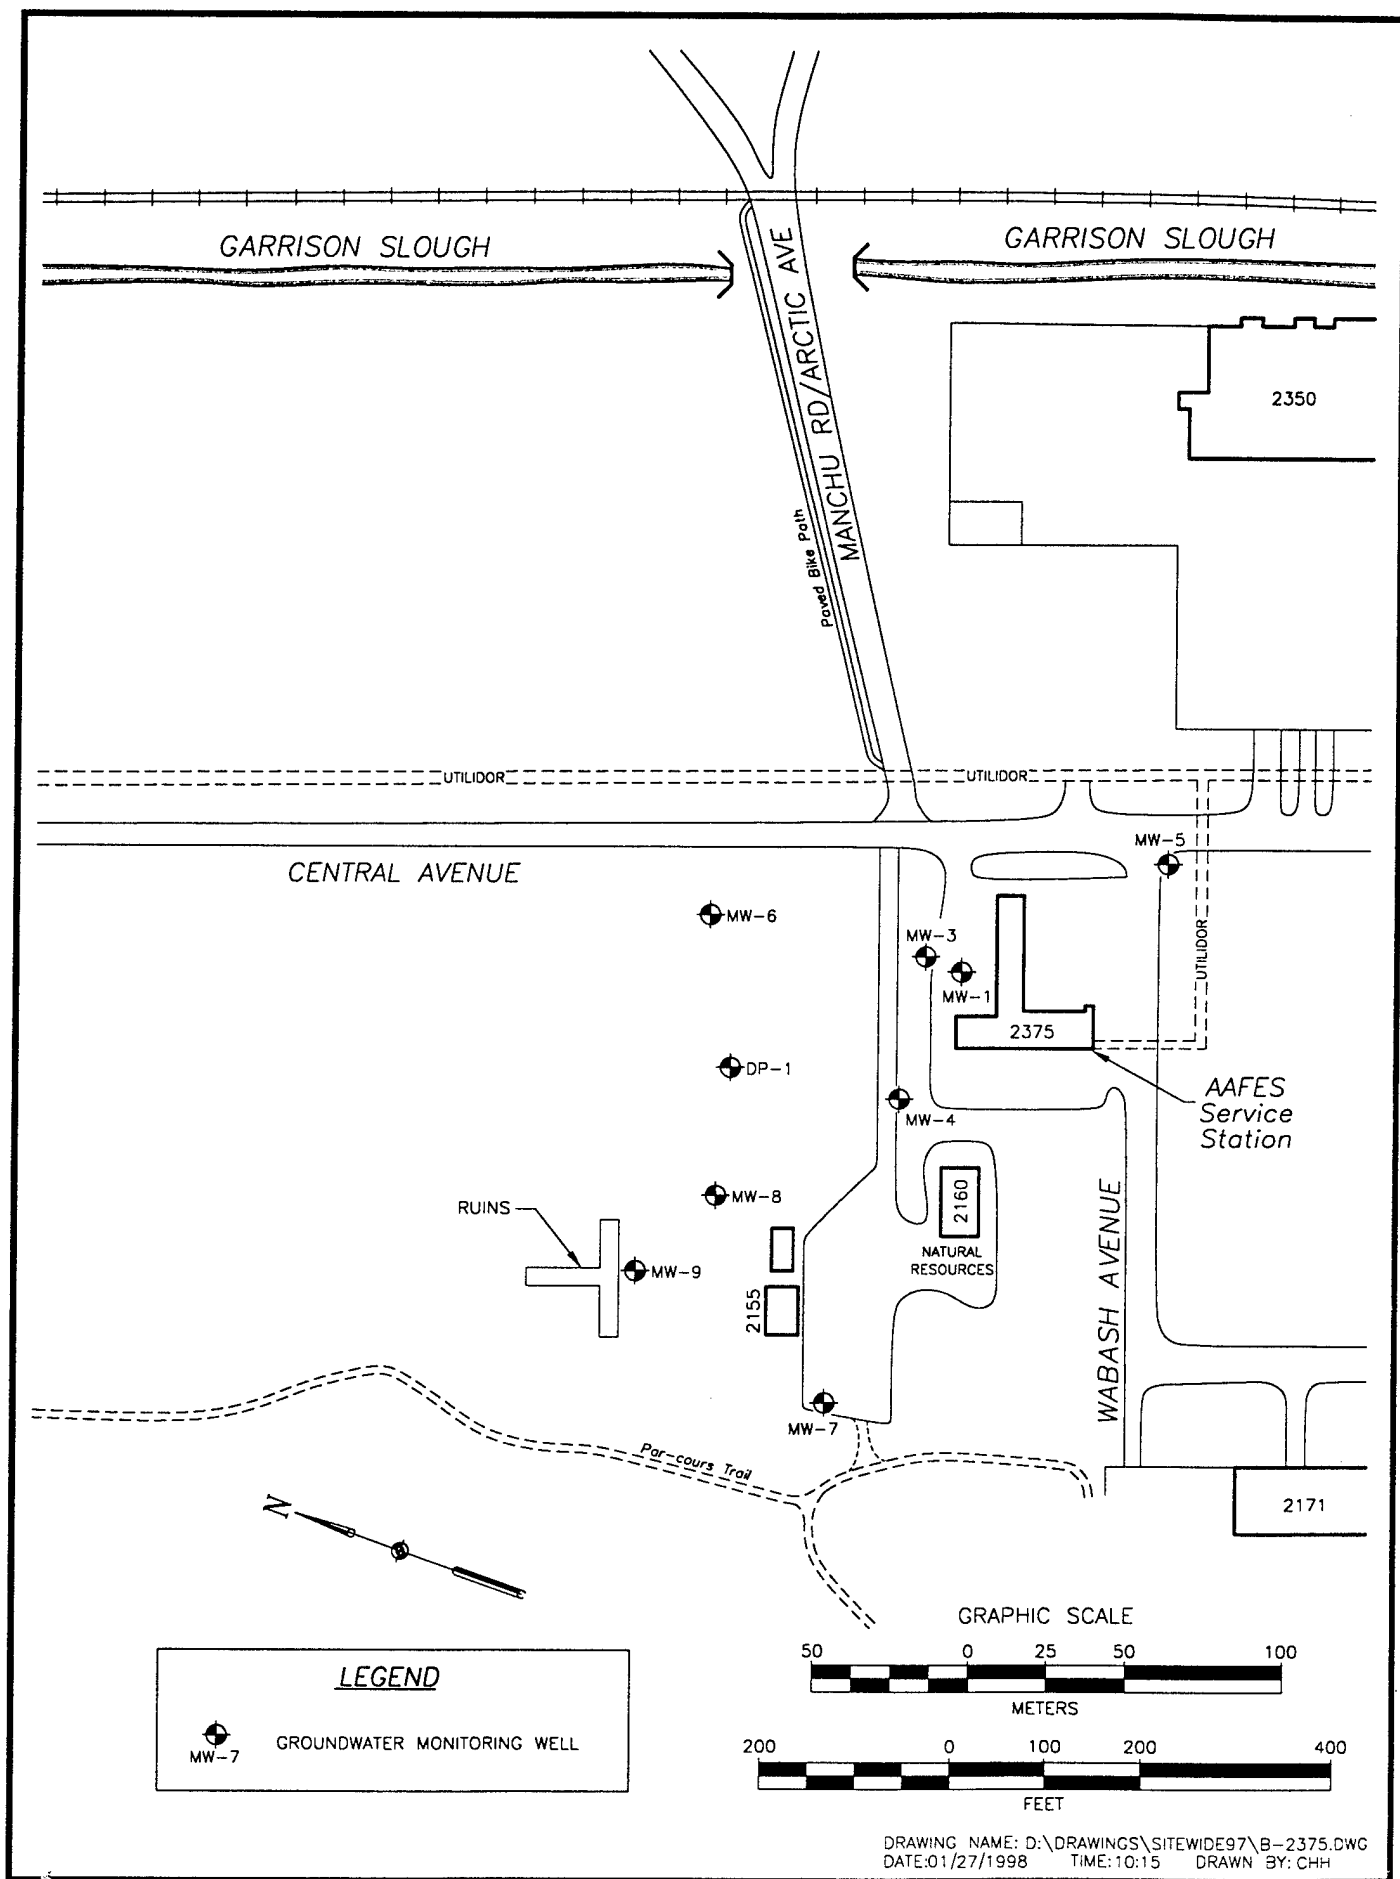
Building 2375 Site Plan Showing Locations of Groundwater Monitor Wells, Eielson AFB, Alaska
